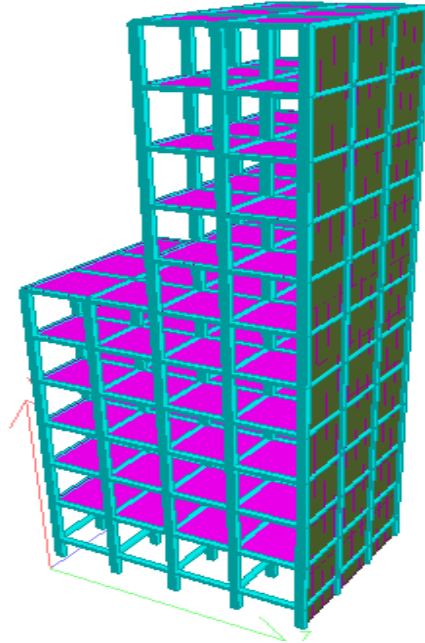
3D VIEW OF G+10 BUILDING WITH SHEAR WALL (Model 02)
